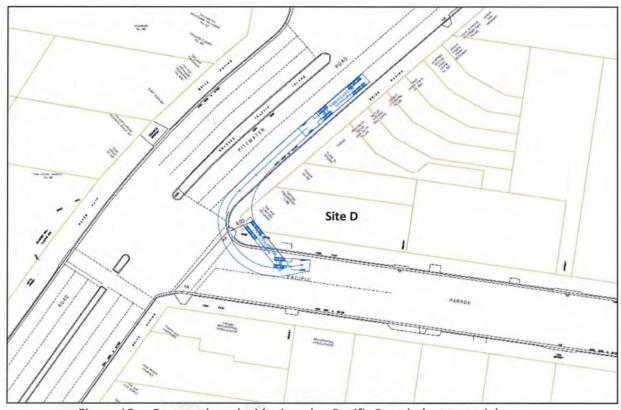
Proposed road widening plan Pacific Parade (not to scale)
